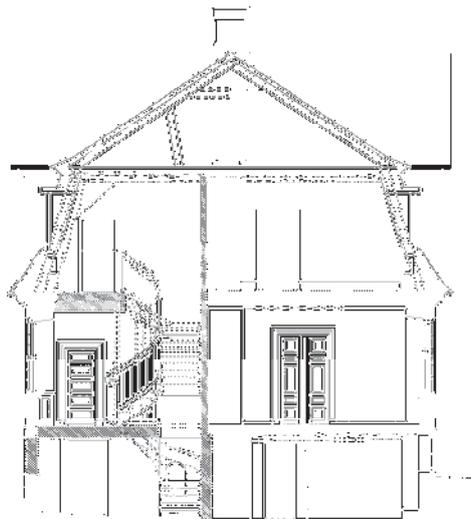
Structural section of the building containing the supervisor's residence. Denoted A in Table 1.
